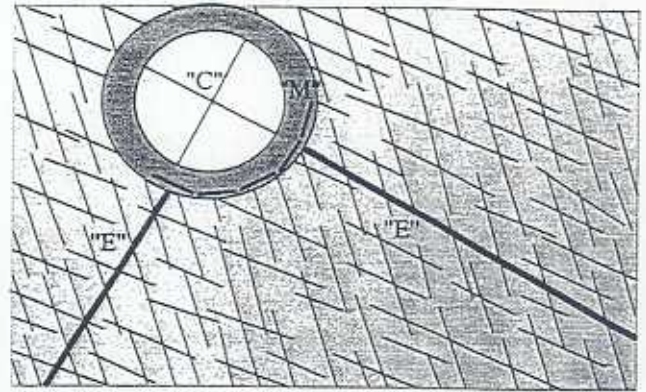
Measuring installations in the test rooms, schematic horizontal section.
